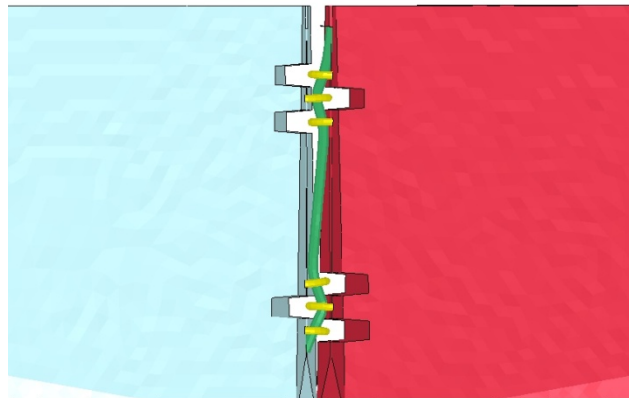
Deformed state of the pin and loop connection at the impact joint.
